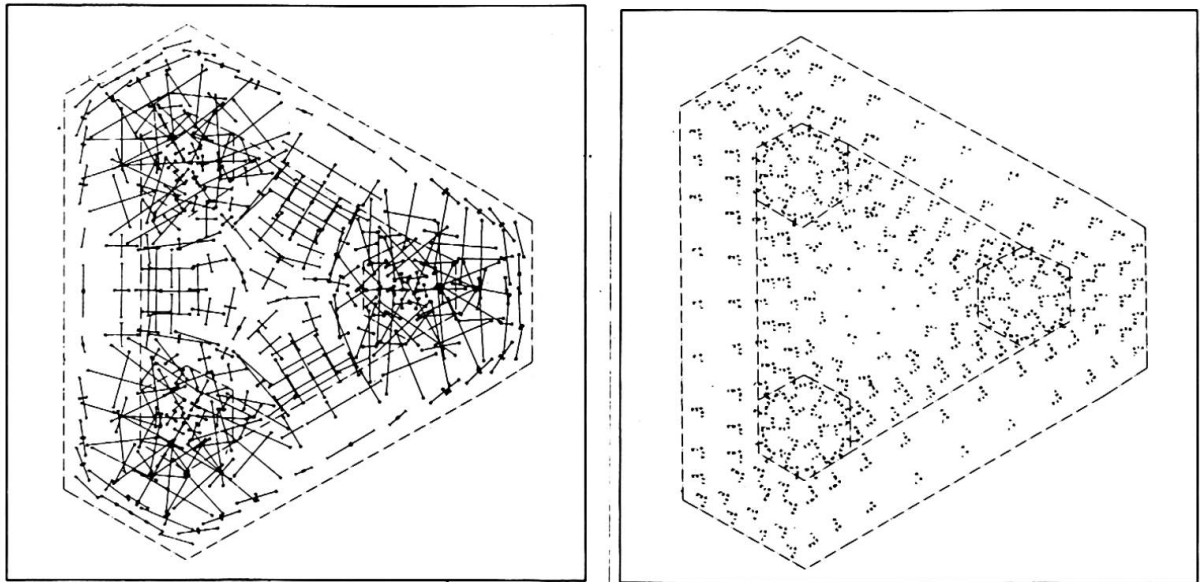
Principal moments and reinforcement dimensions for a reinforced concrete offshore platform.
